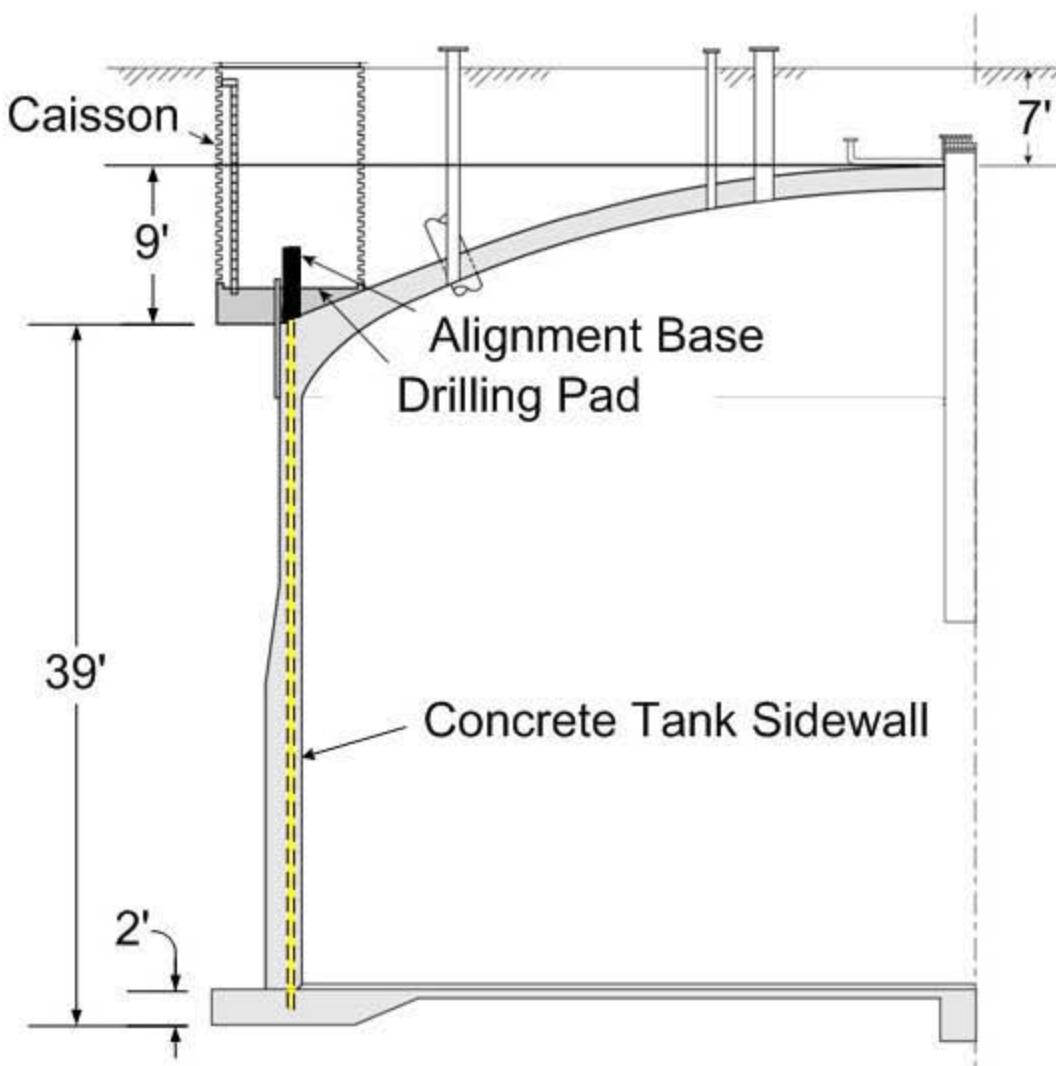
A-106 (Type IVb) SST Sidewall Coring Schematic
